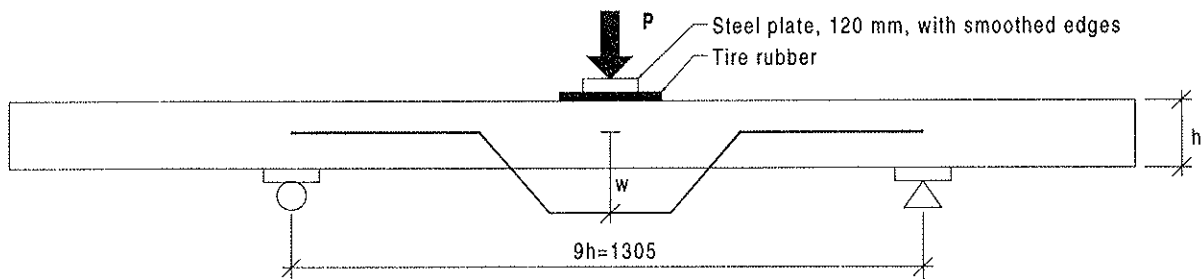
Test arrangement for determining bending strength of a board subjected to a point load.
